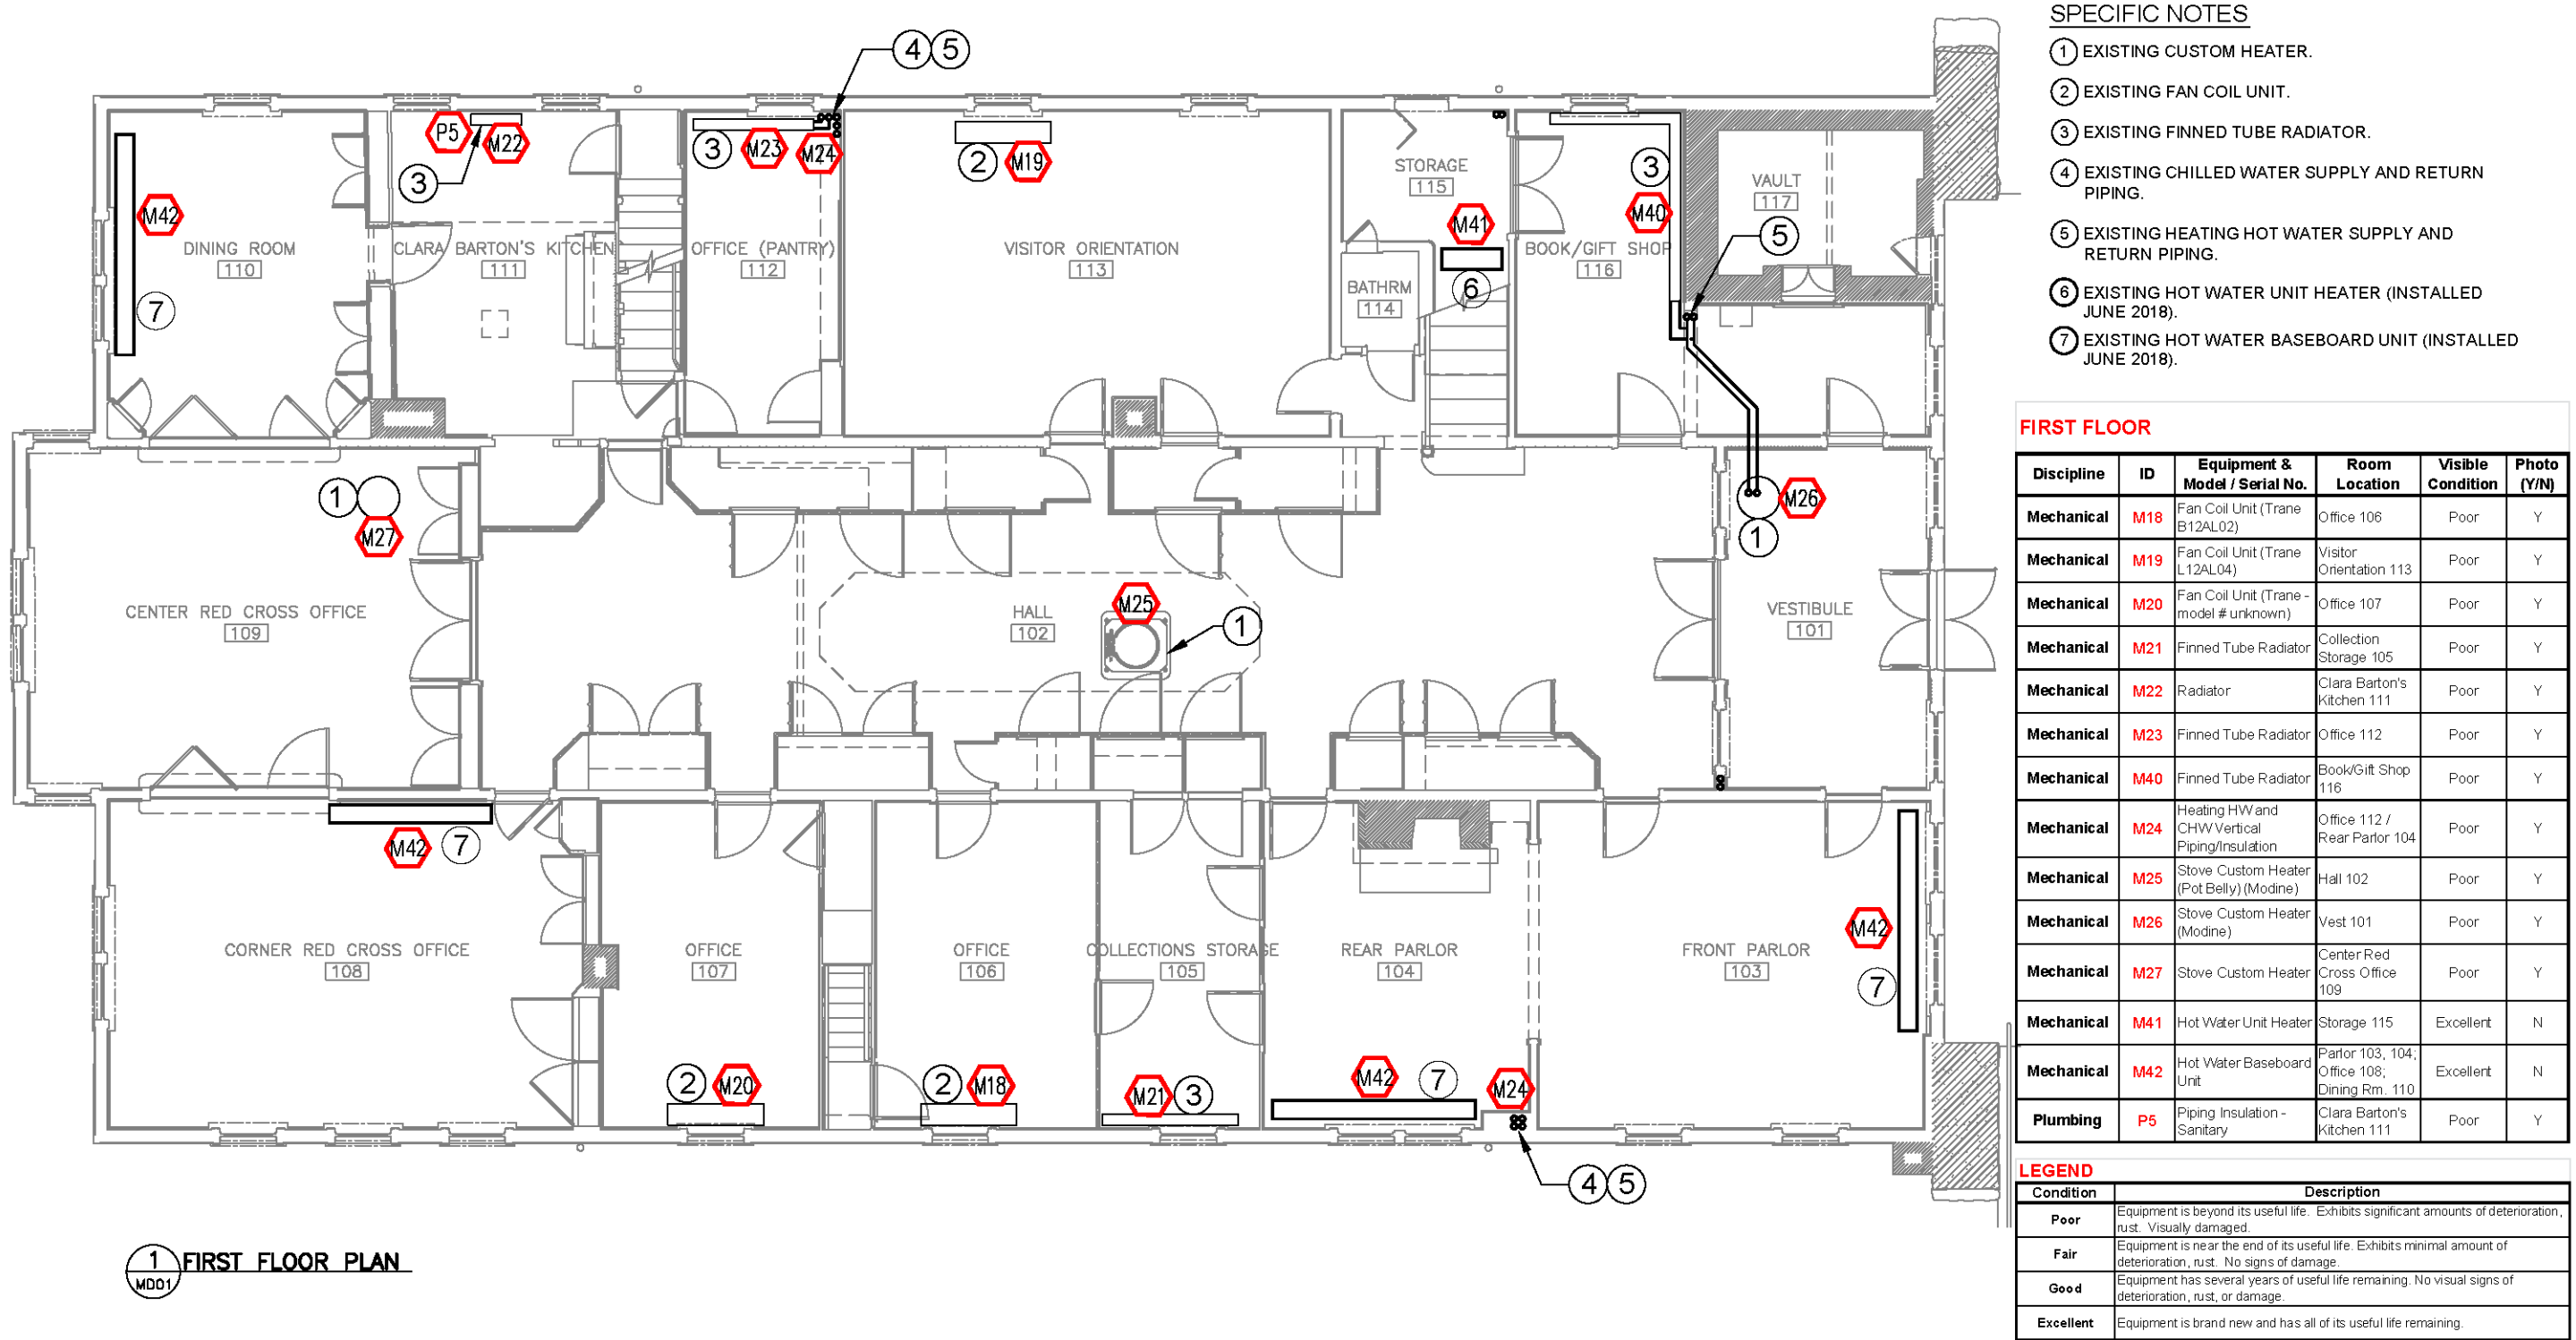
Mechanical / Plumbing Existing Conditions Plan - First Floor
